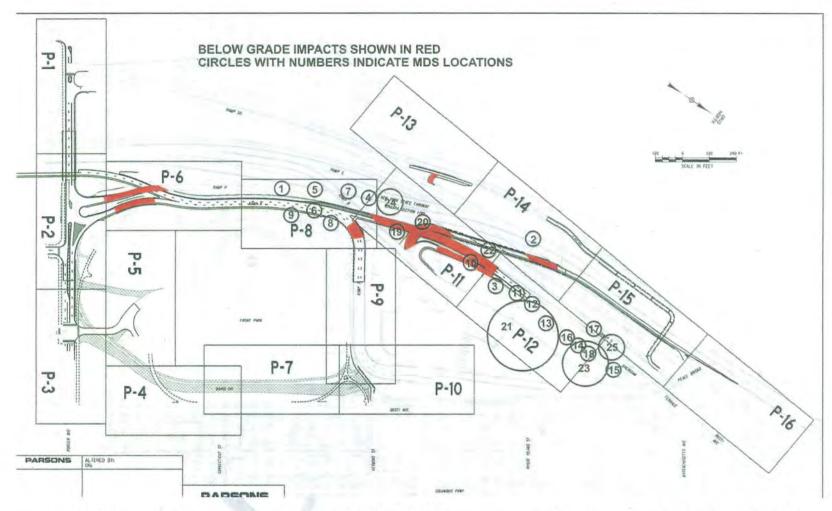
Location of proposed deep construction impacts for PIN 5760.80.101, NY Gateway Connections Improvement Project to the US Peace Bridge Plaza, City of Buffalo, Erie County, New York (MCD 02940).
